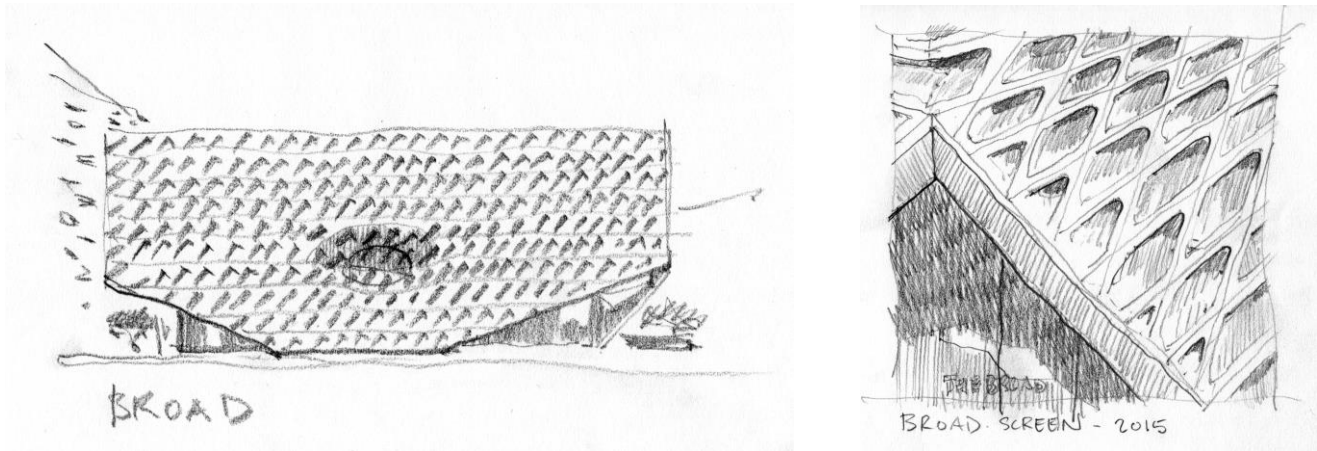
Broad Museum, Los Angeles, 2015, DS+R Architects. Elevation and close-up views. The façade reads as a perforated structural shell, but is made of thin GFRC panels on a curtain wall framing system.
